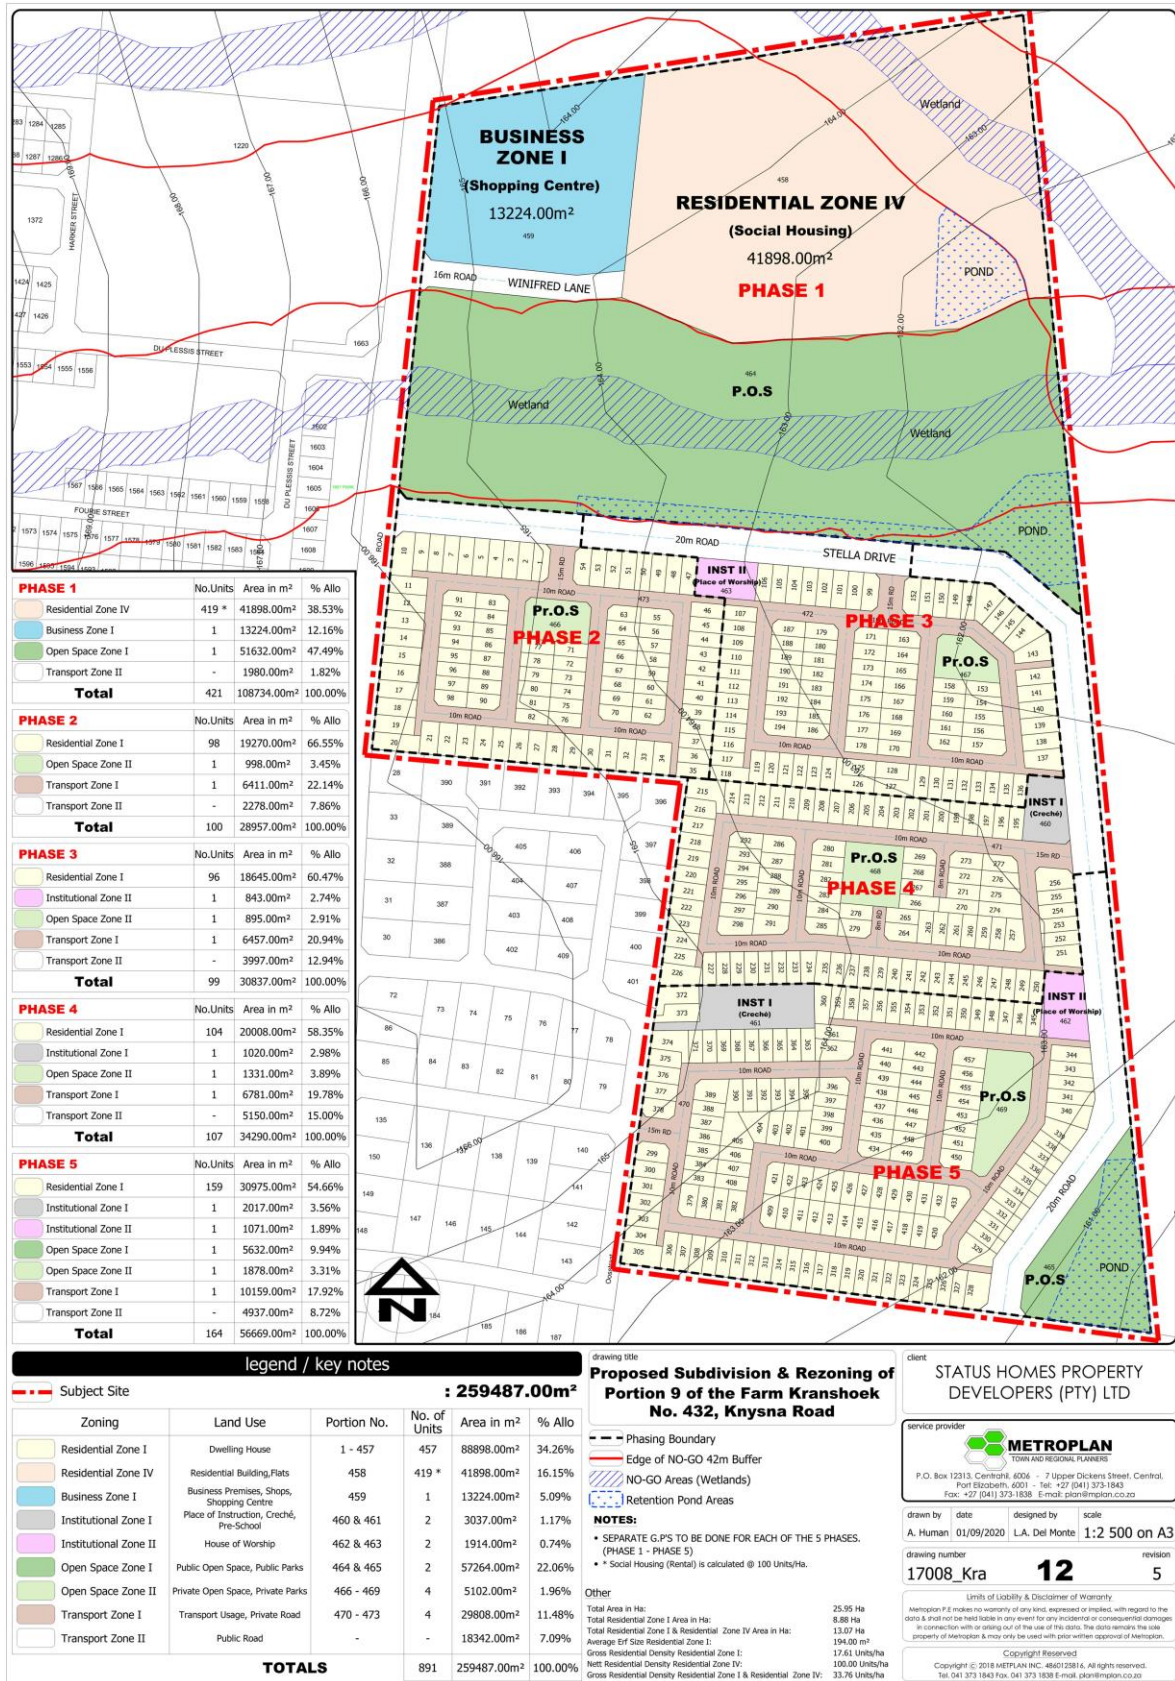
Proposed Preferred Site Layout Plan (as per Appendix C1)
